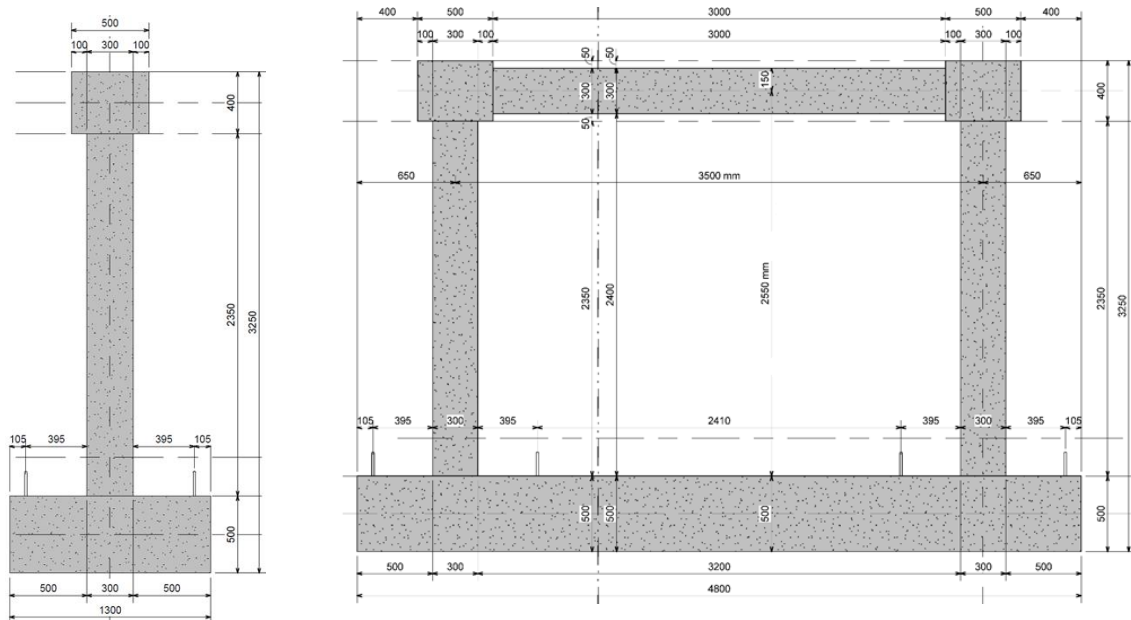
a) Column specimen geometry; b) Frame specimen geometry
